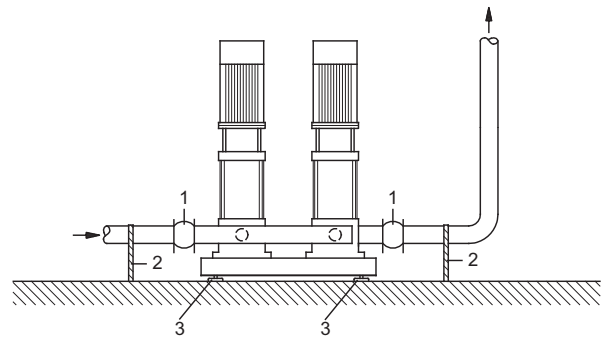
Sketch showing the position of expansion joints, pipe supports and machine shoes
